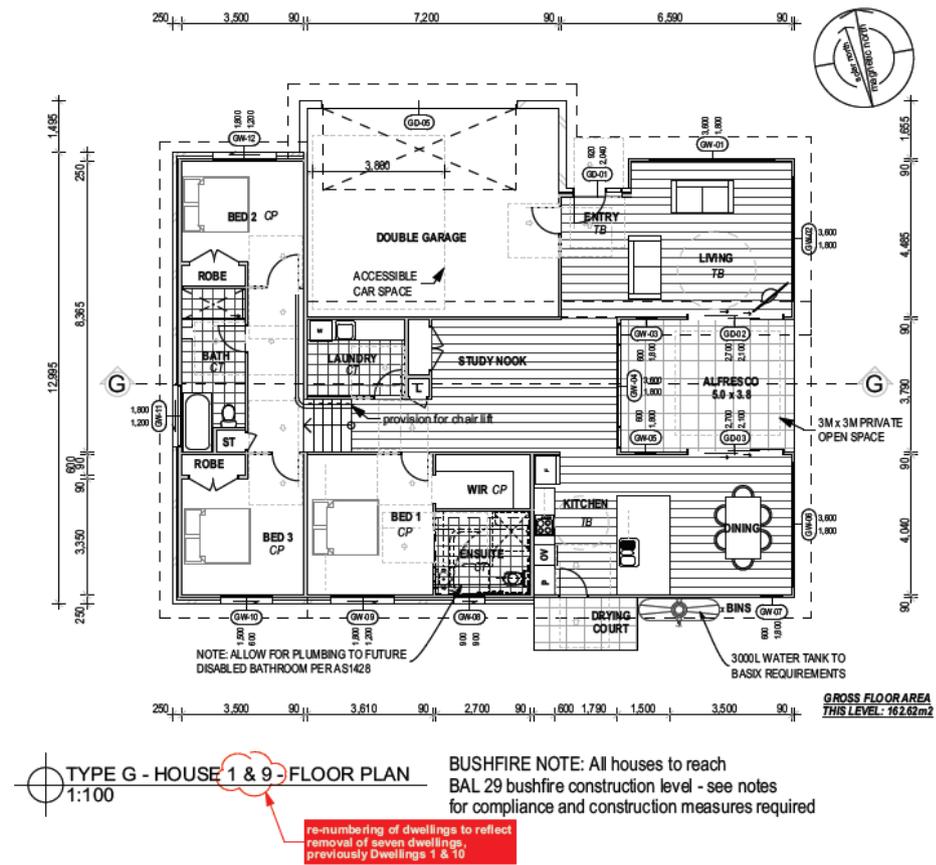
Proposed Housing Type G Floor Plan (Dwellings 1 & 9)
